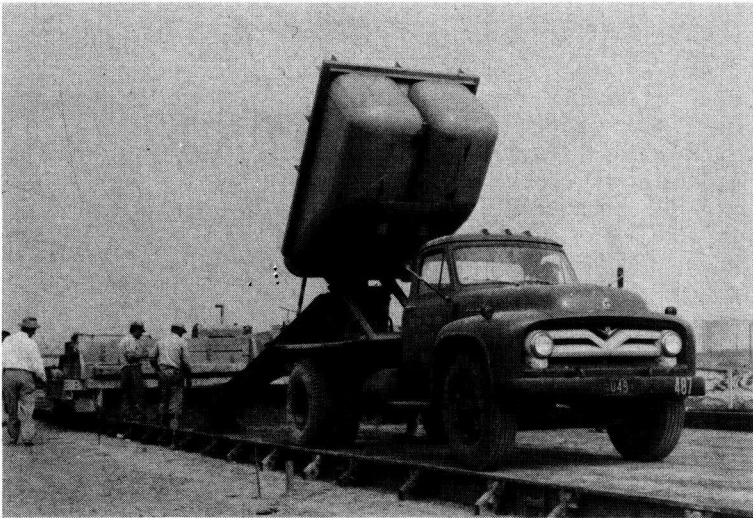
Placing concrete from Brewster plant, New Jersey Turnpike Extension.
